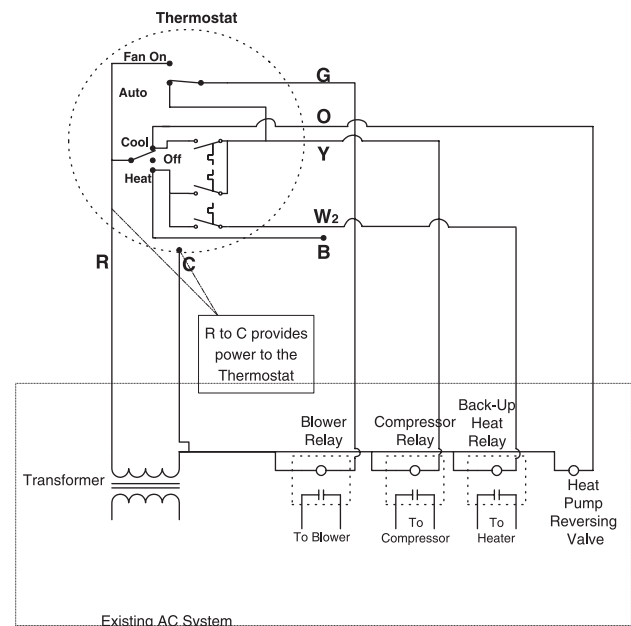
Heat Pump Thermostat that Activates the Reversing Valve on Heating
